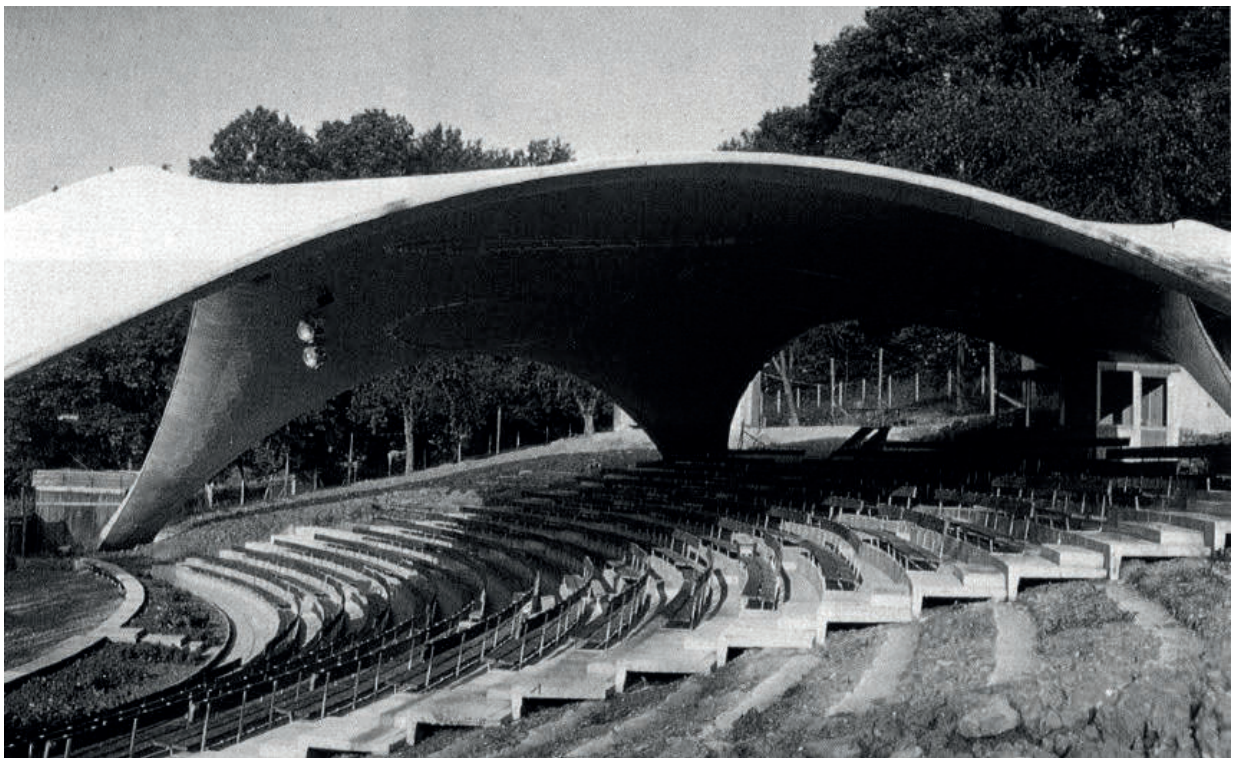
Concrete shell made by Heinz Isler [5]
